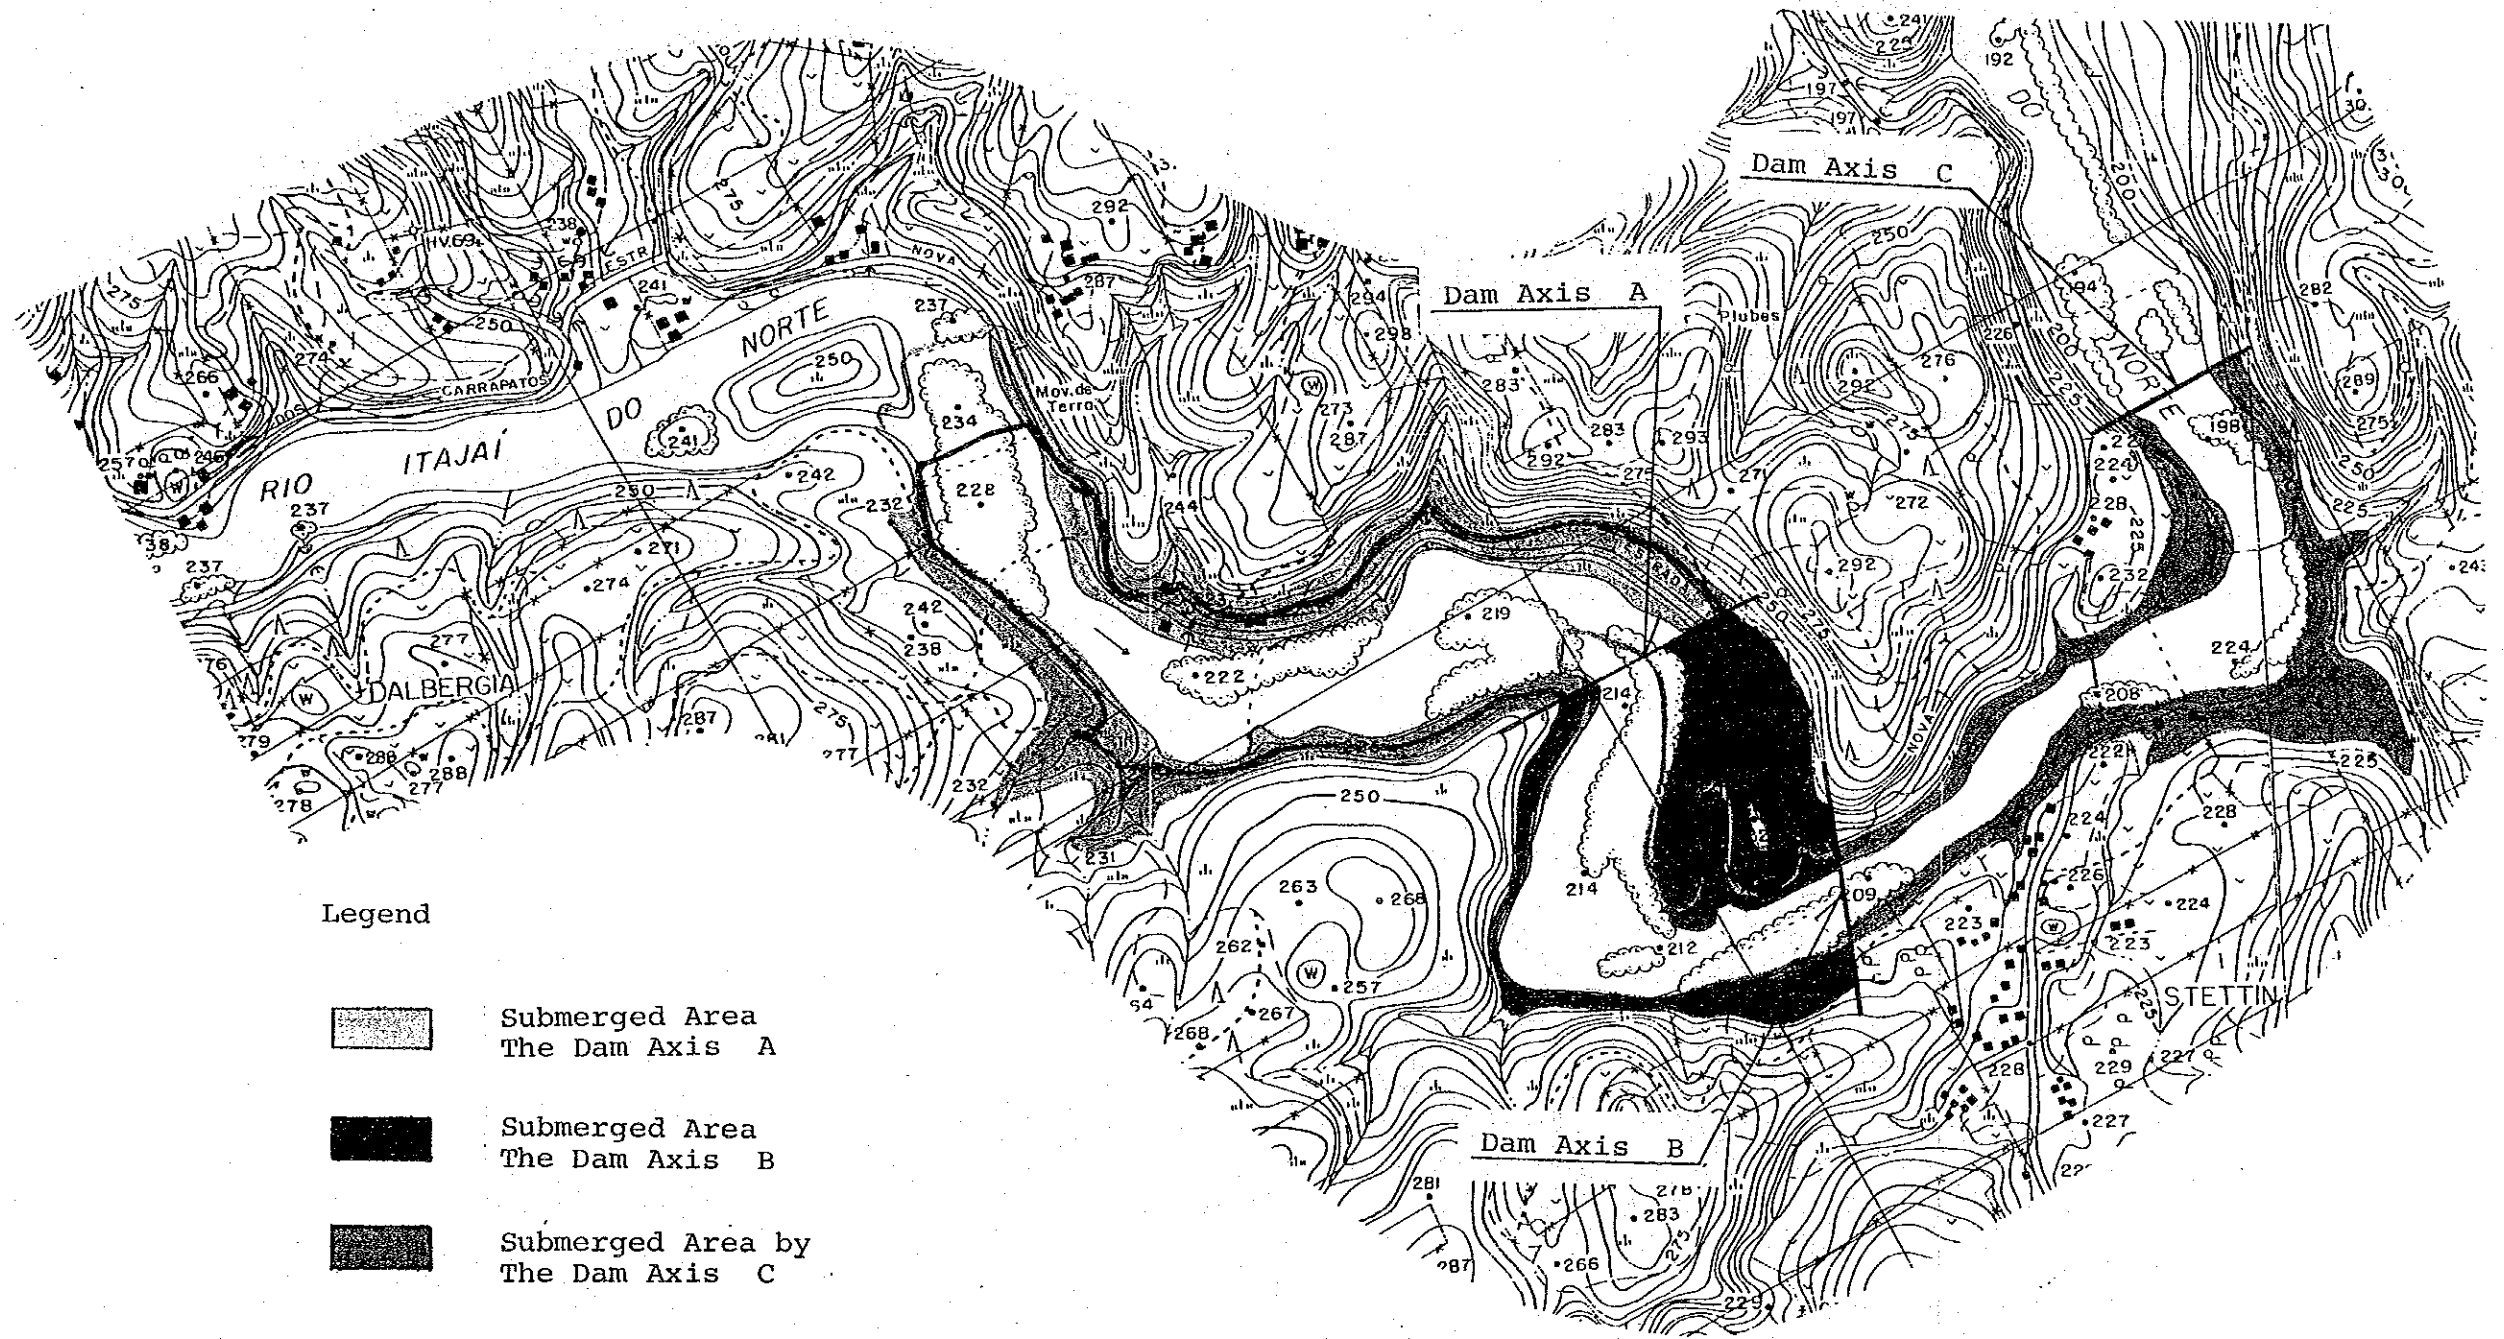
ZONING PLAN OF DALBERGIA
